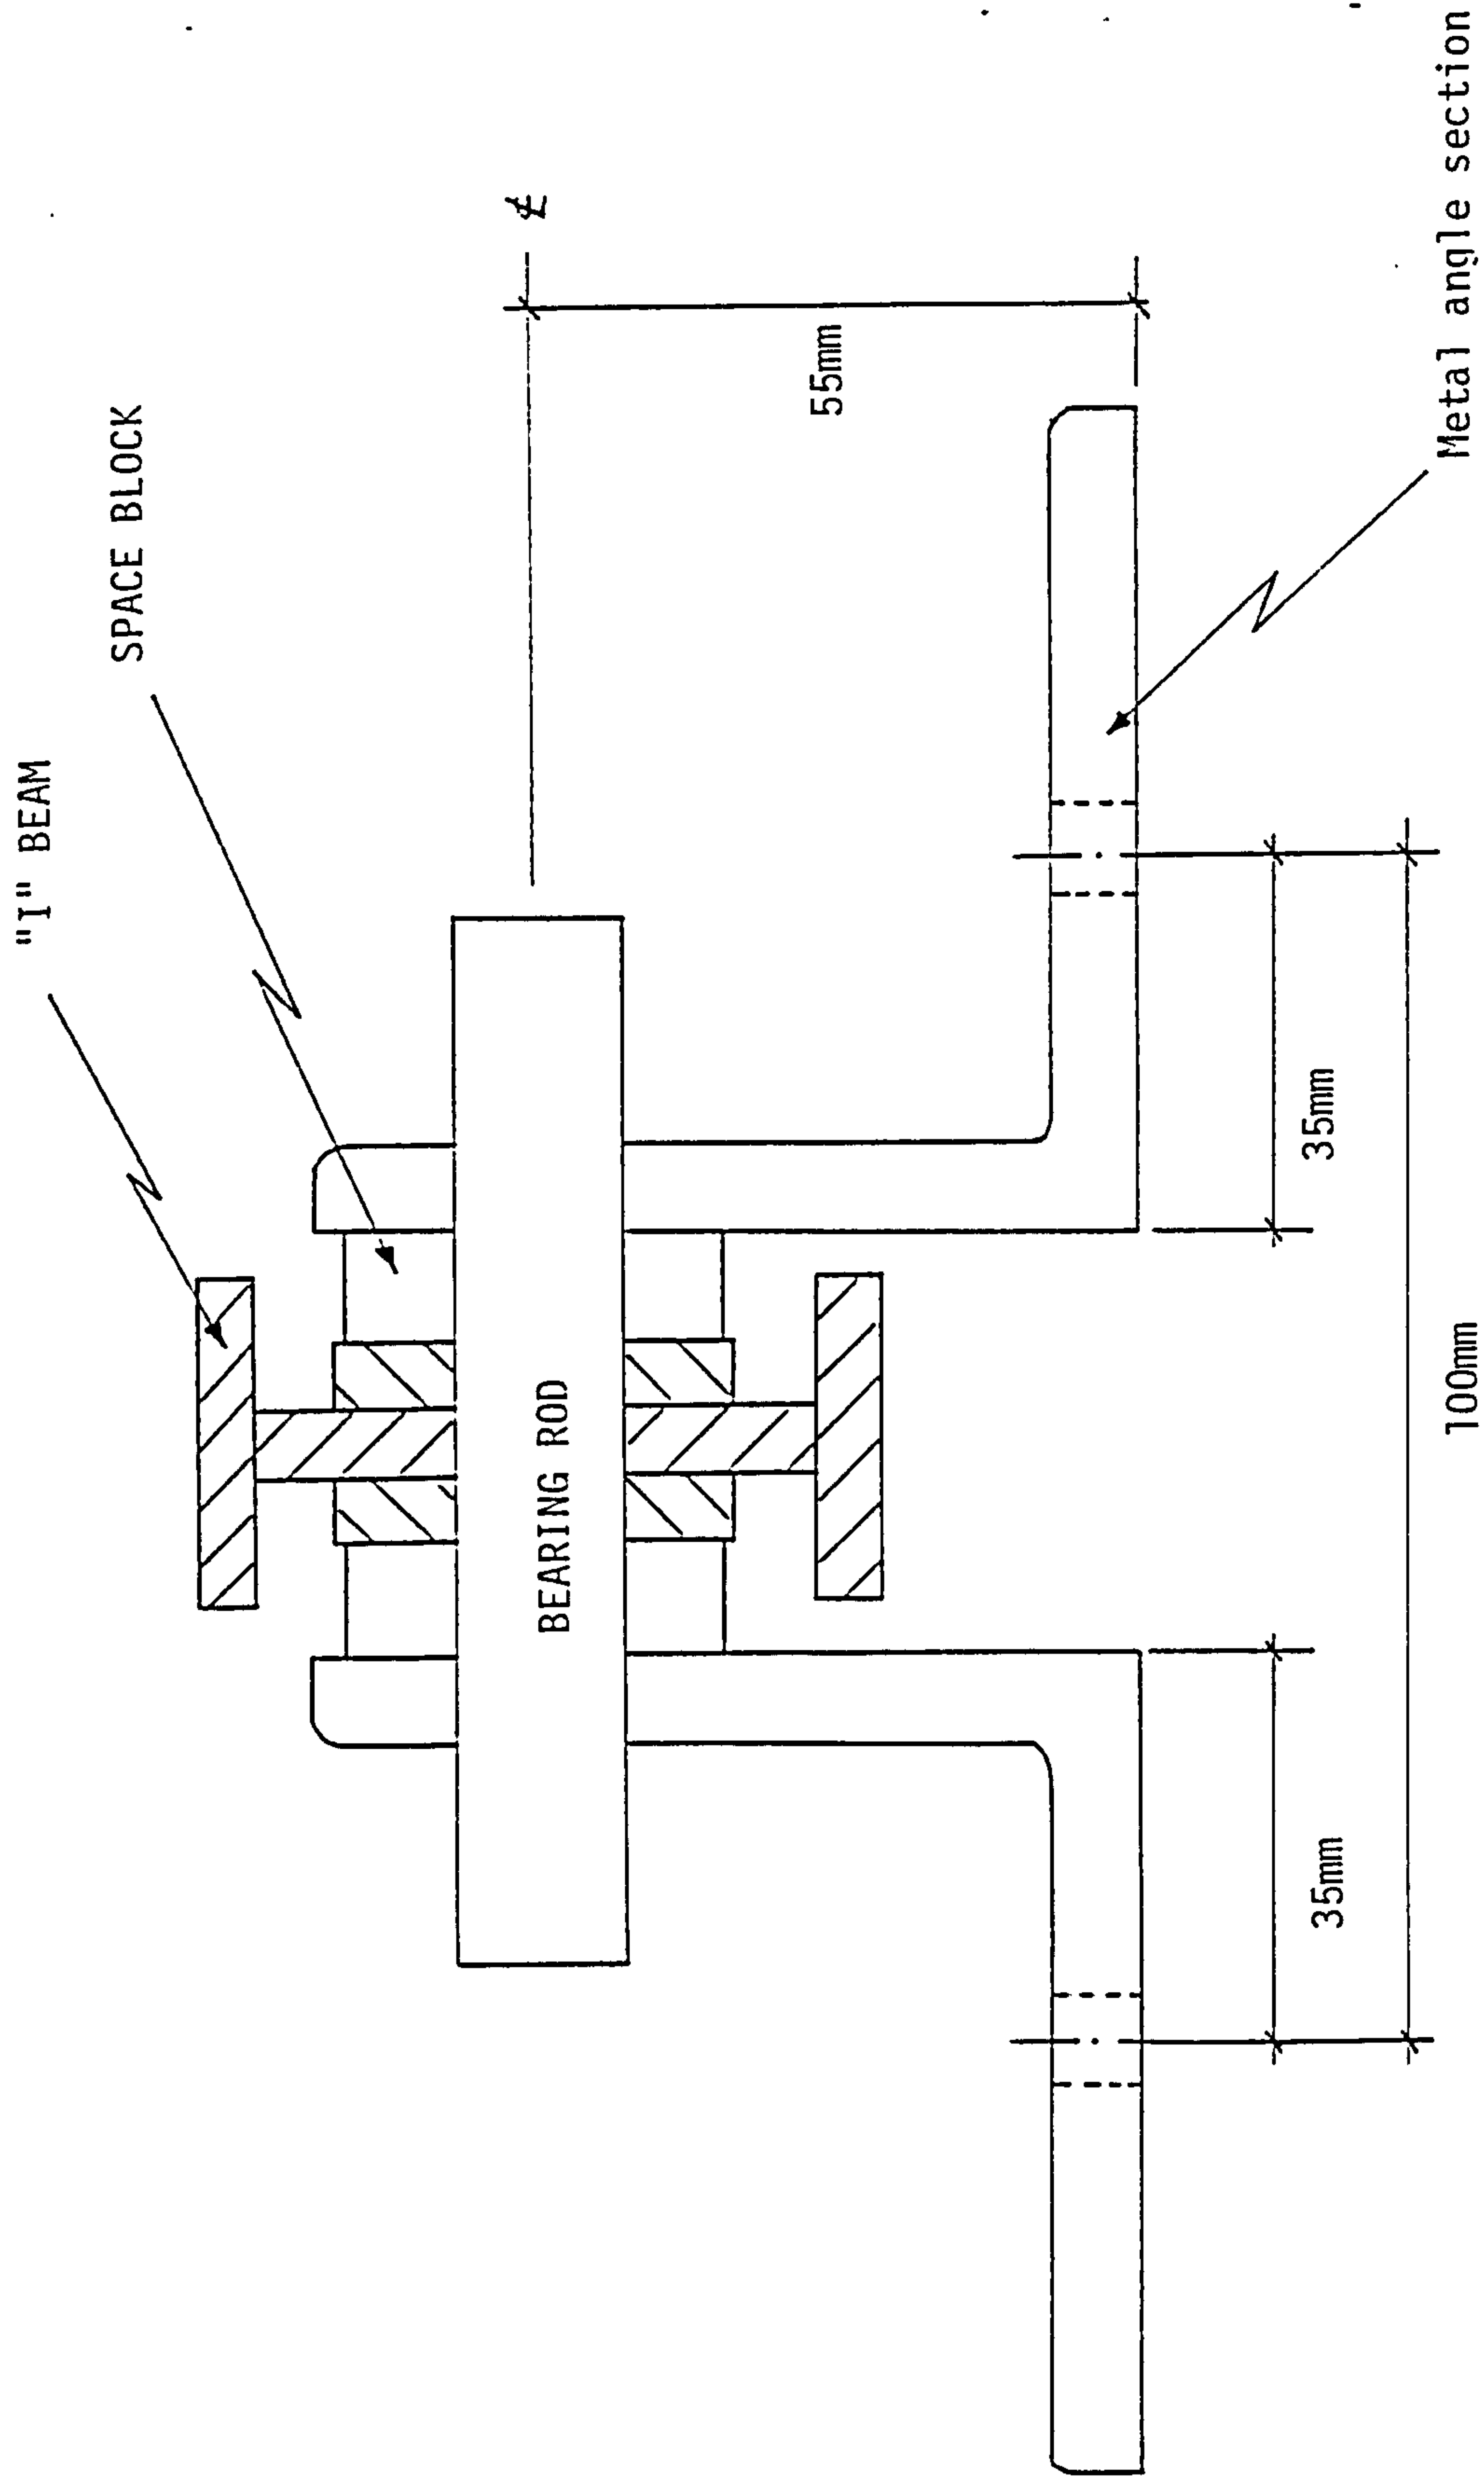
SECTION OF MODEL BRIDGE SUPPORTS
